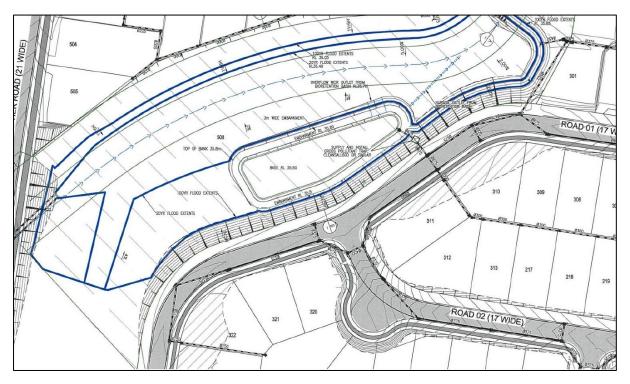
Approved stormwater plan - DA 12-3005 (extract)
